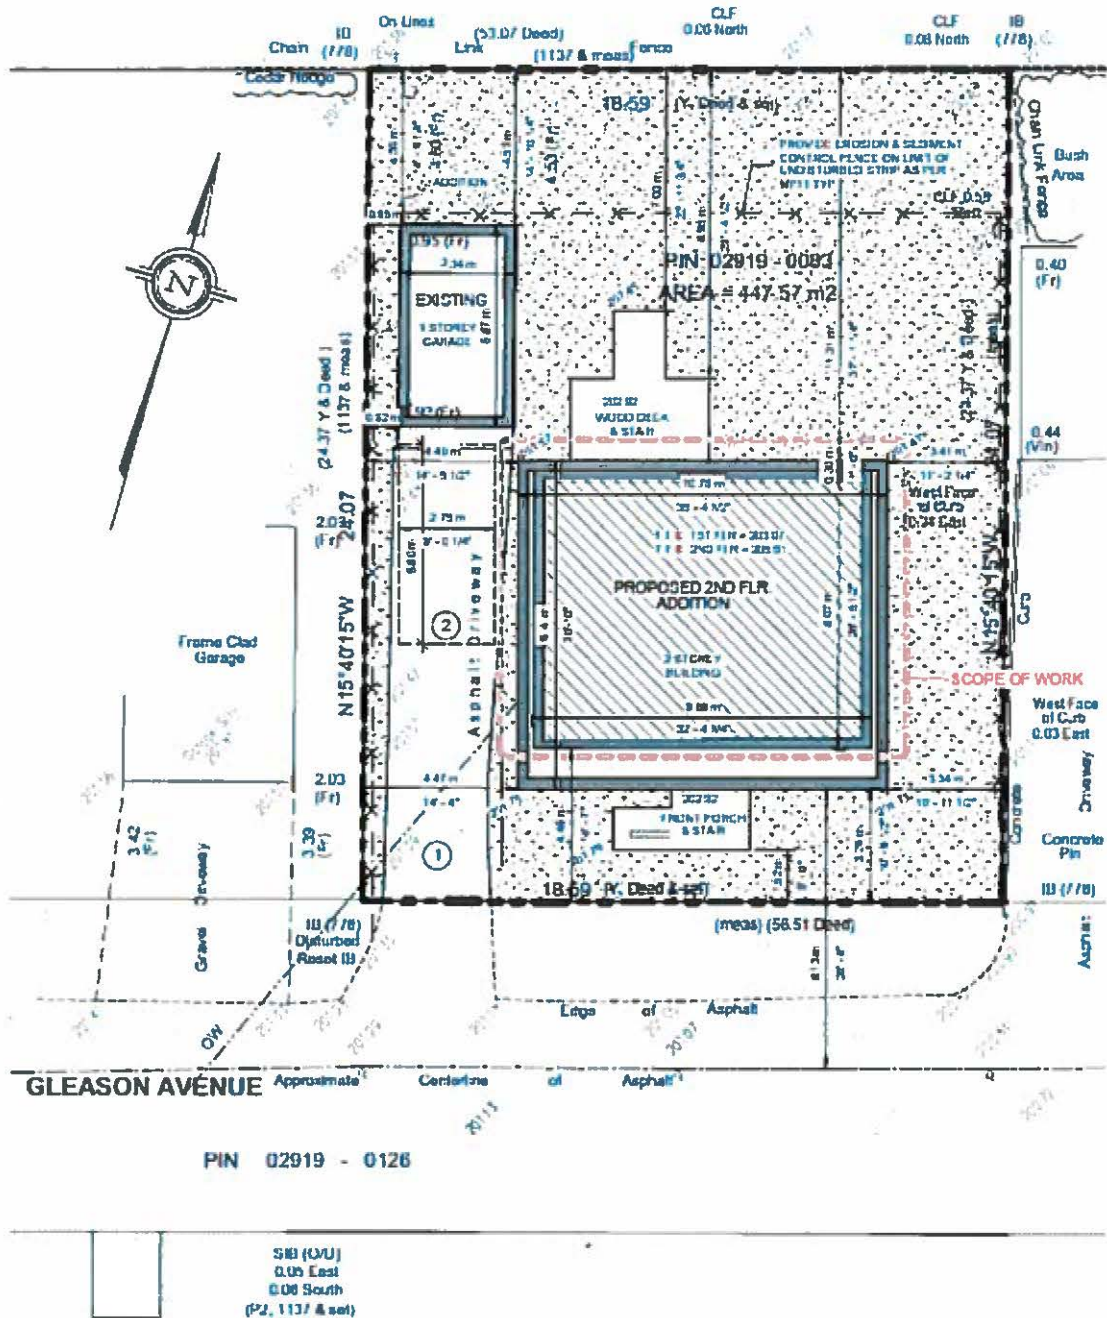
PROPOSED SITE PLAN AND ELEVATIONS FOR 12 GLEASON AVE. JUNE 2017 & 2018
